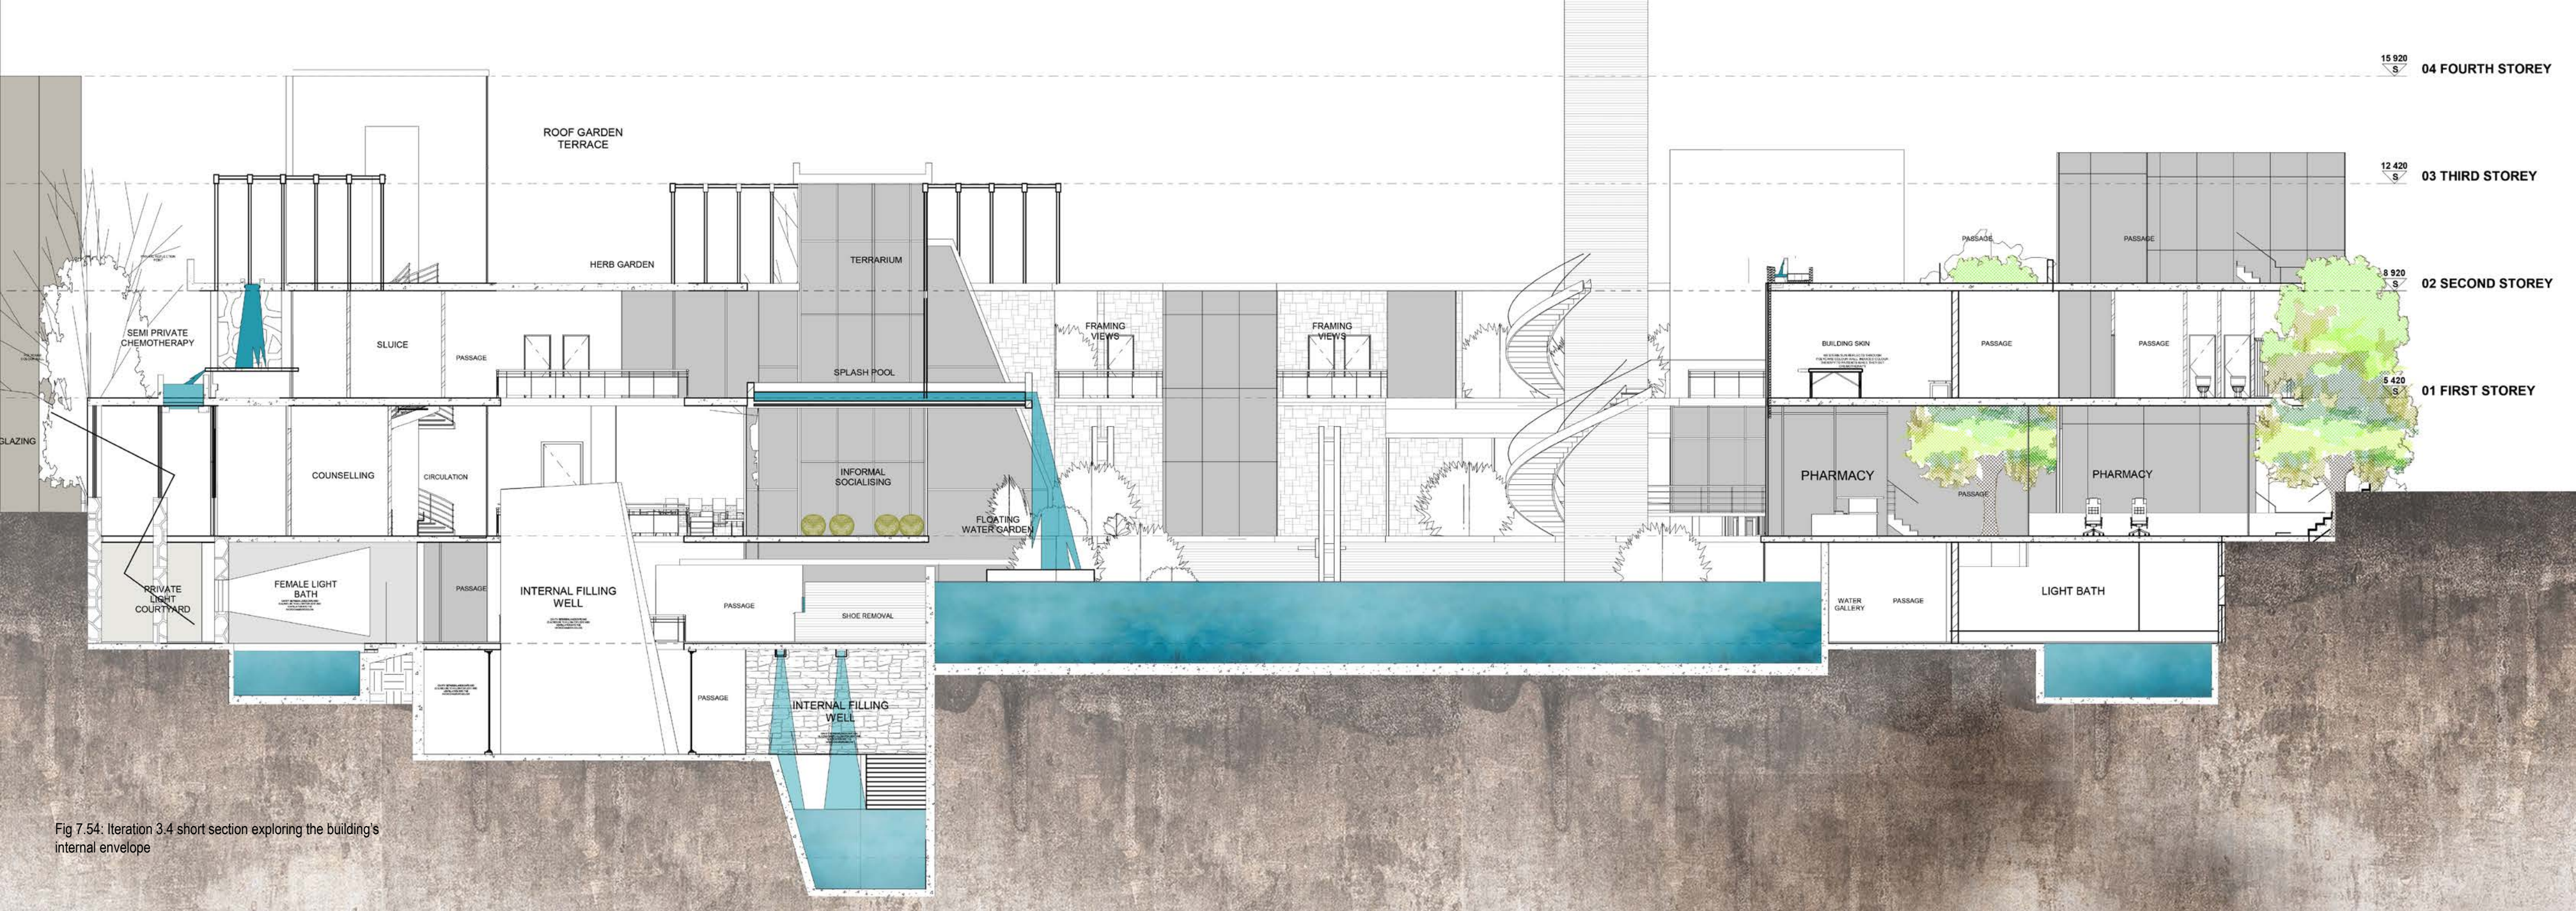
Iteration 3.4 short section exploring the building's internal envelope
